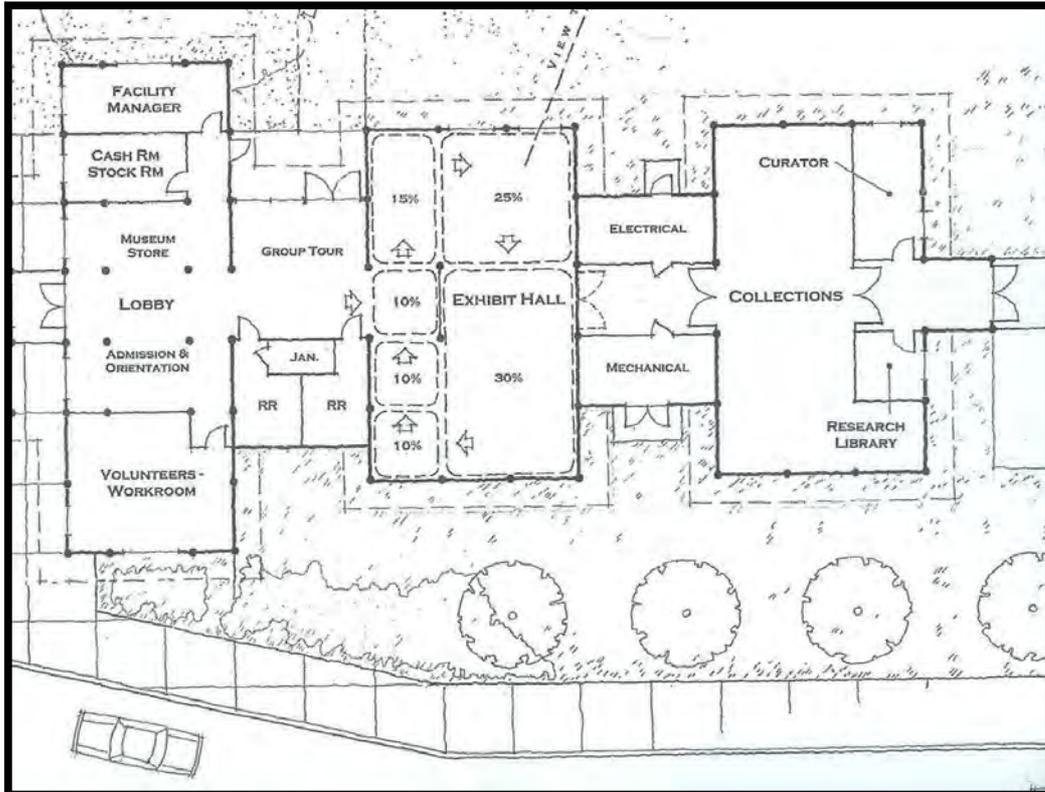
Floor plan for new interpretive center proposed in 2006 Draft Master Plan, approved in May, 2009
